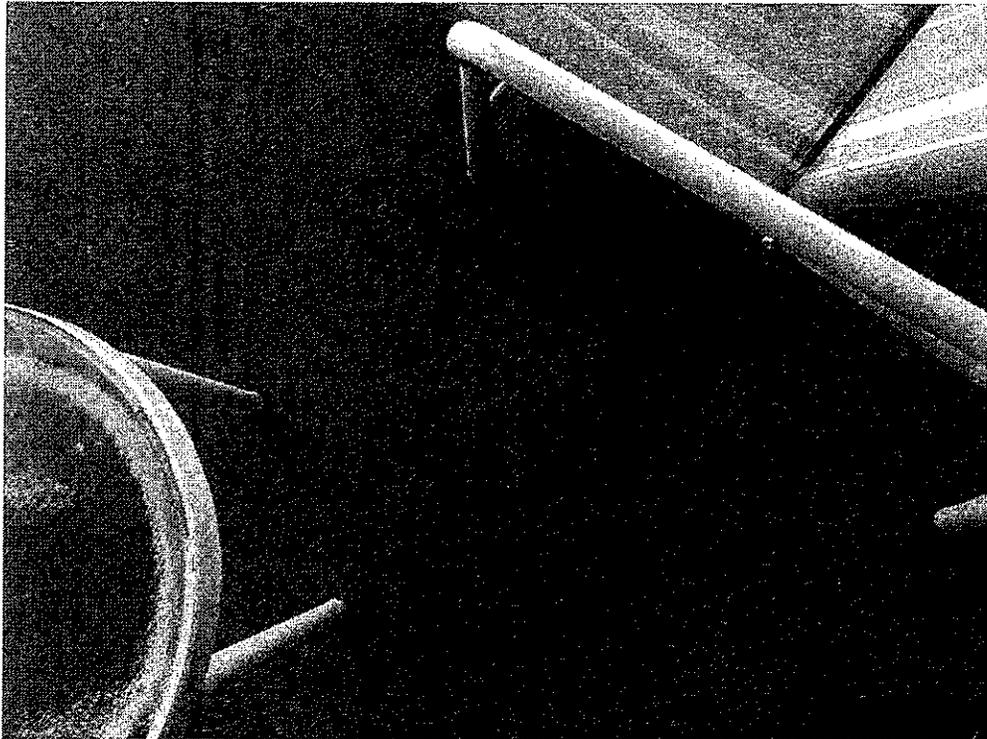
Minor cracking of the concrete slab-on-grade at the 1<sup>st</sup> level lanais of the guest unit buildings (Building D)
